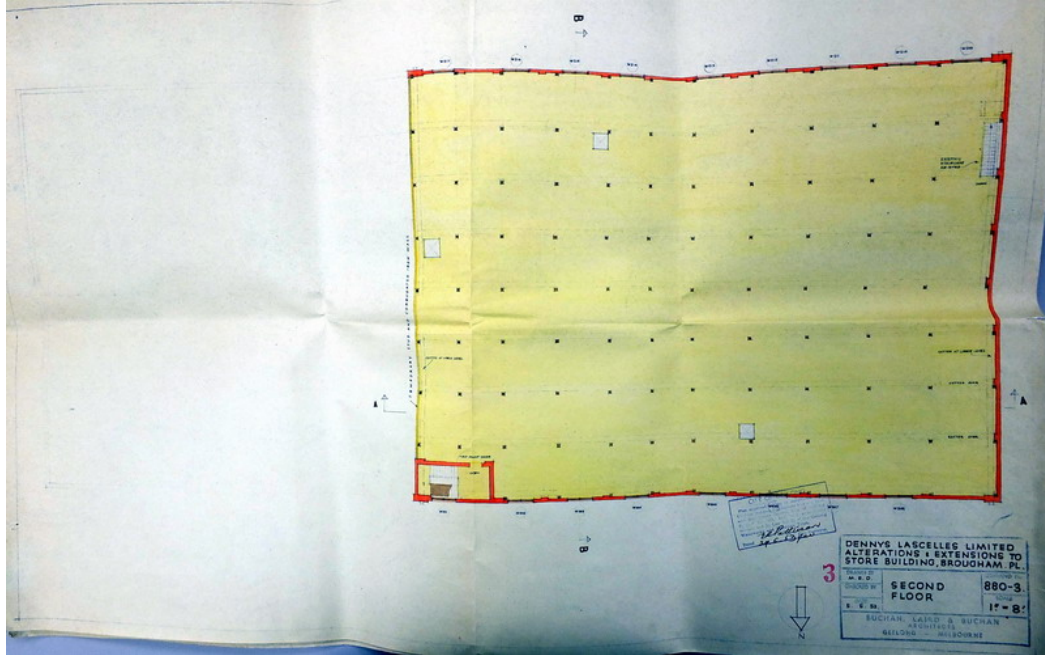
Buchan Laird & Buchan, Second Floor, proposed additions to Dennys Lascelles Ltd, 4 May 1953. Source: City of Greater Geelong Building Permit file 6828/53
